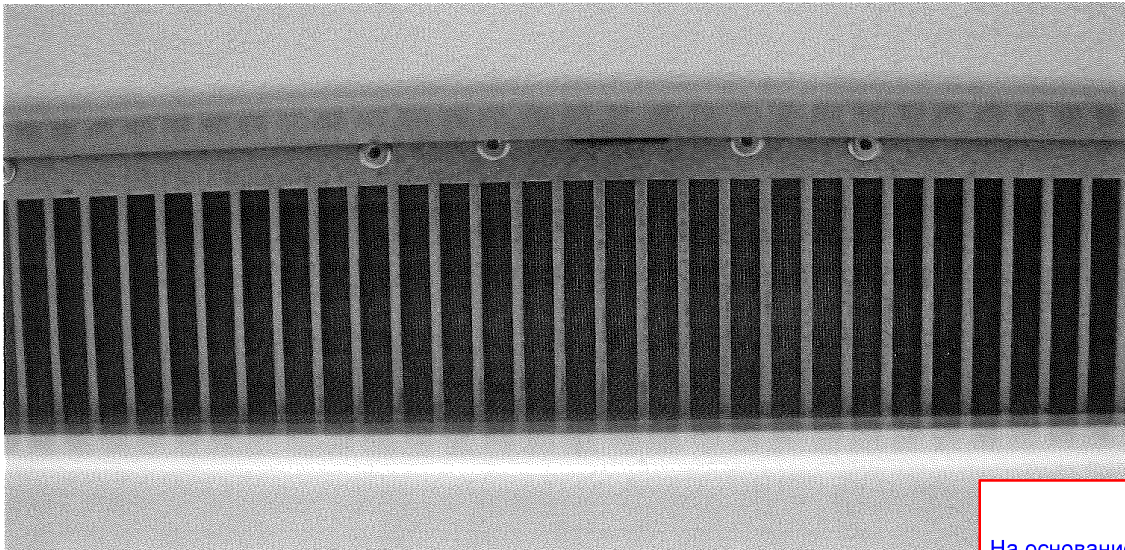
Detail of ventilation drawer UGZS1 12.25.32
